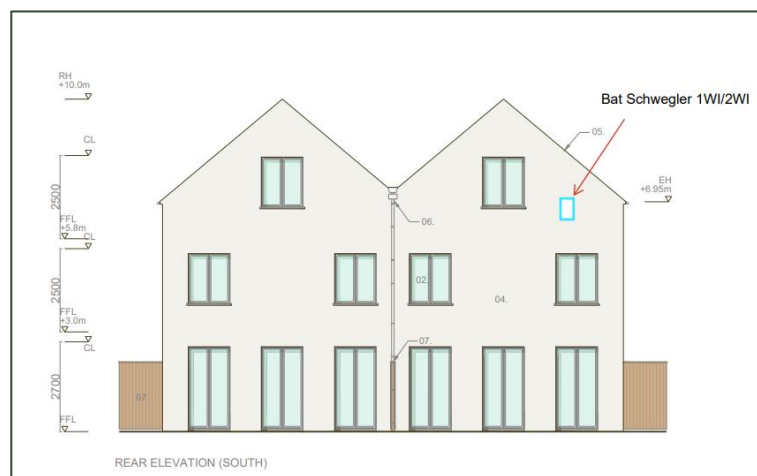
Example of location of externally mounted bat box on structures (blue).
